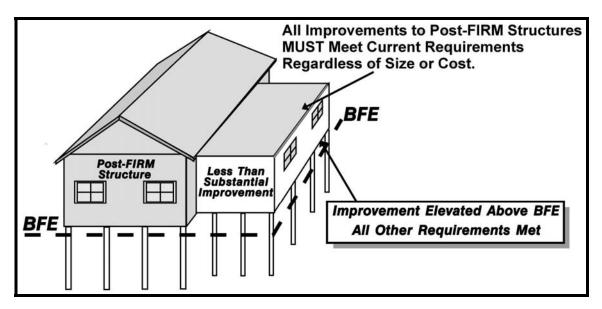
Small additions to post-FIRM buildings must be elevated.
